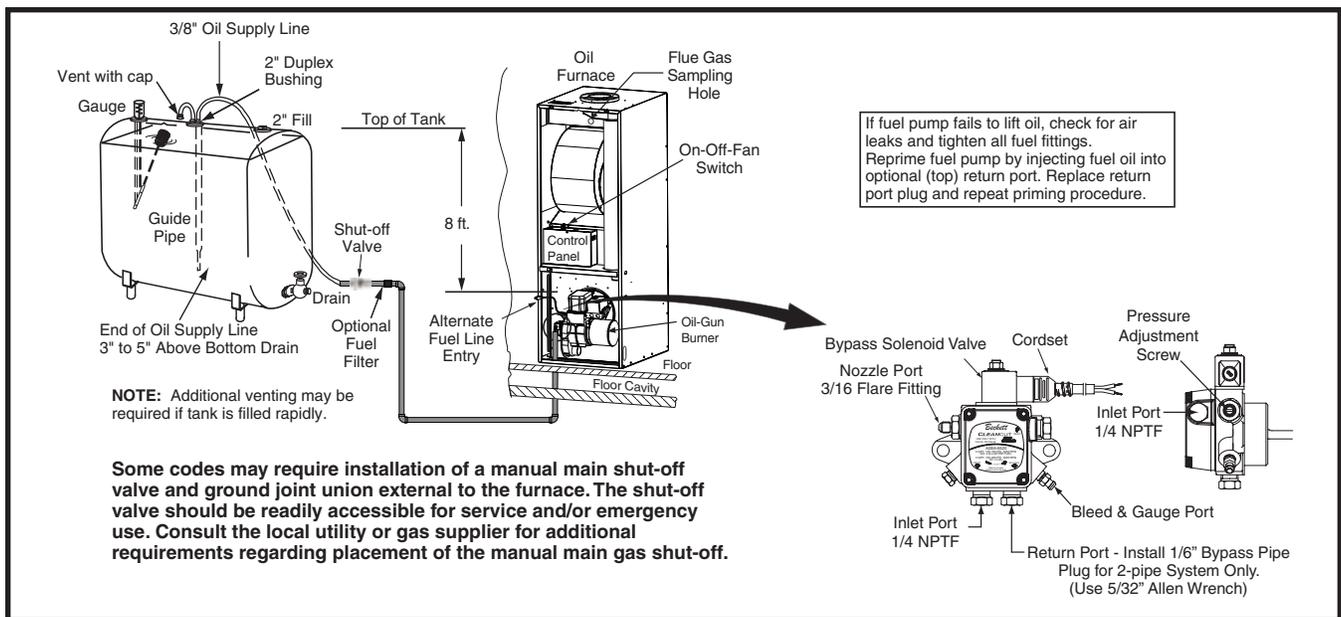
Typical Oil Piping for Above Ground (Single-Line) Supply
